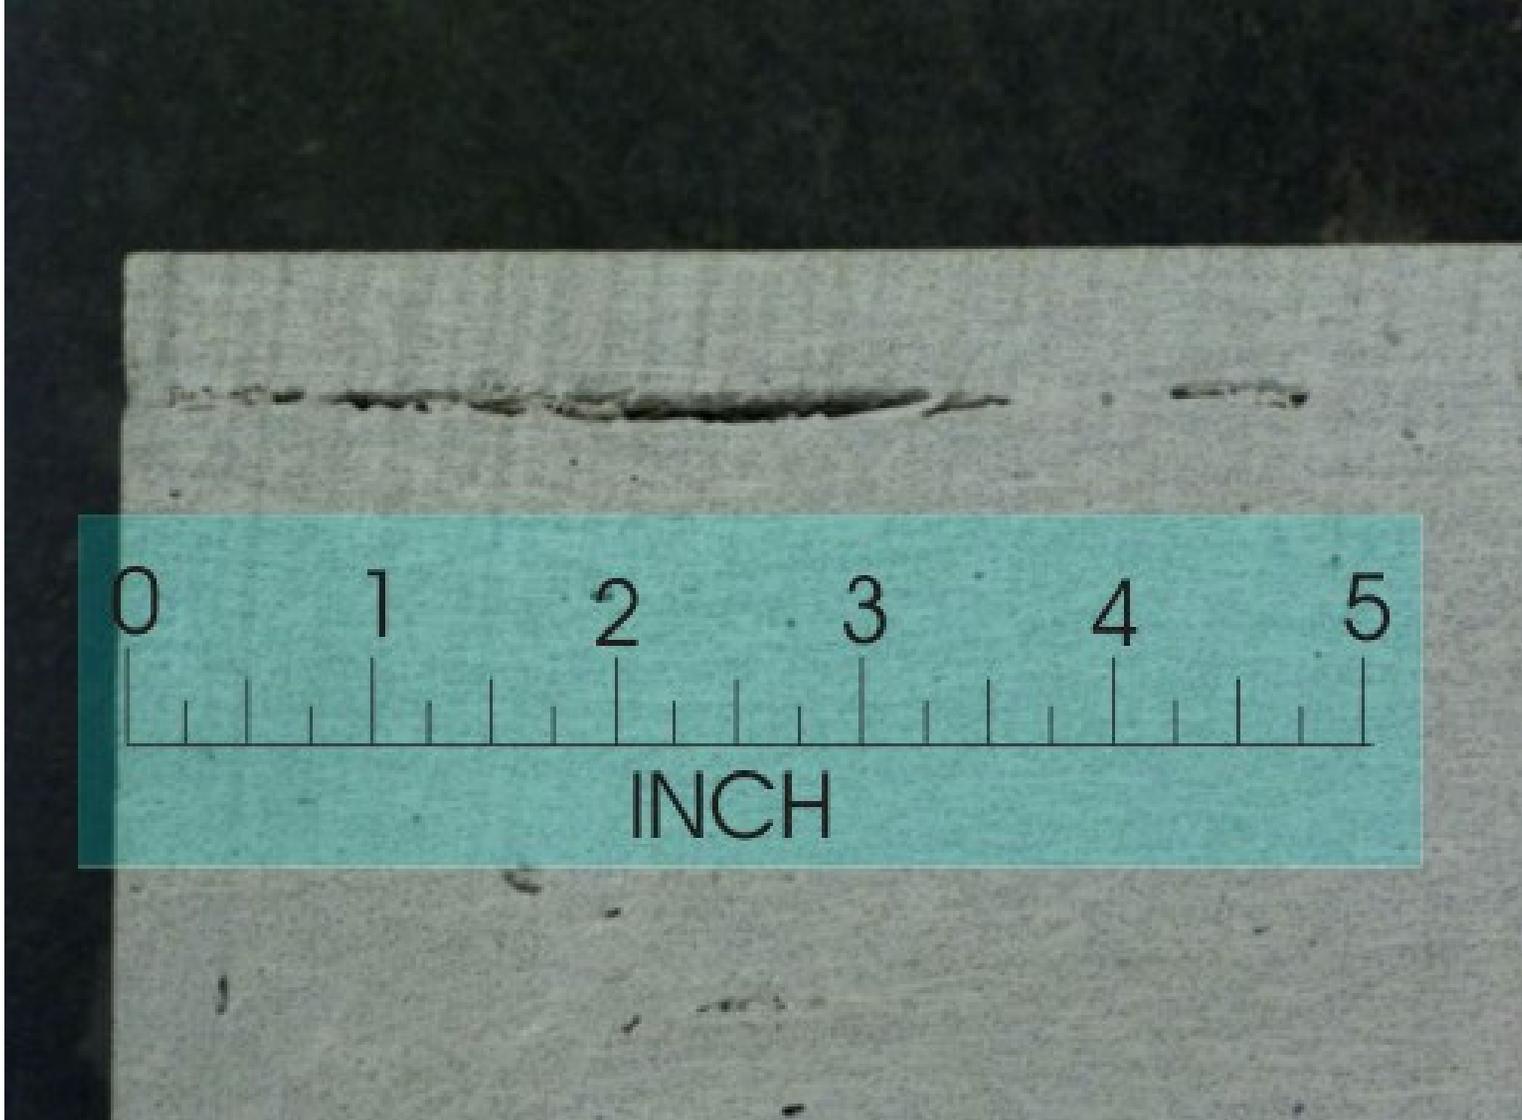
Closeup of “Fissure” in Glass Fiber Reinforced Concrete Specimen
